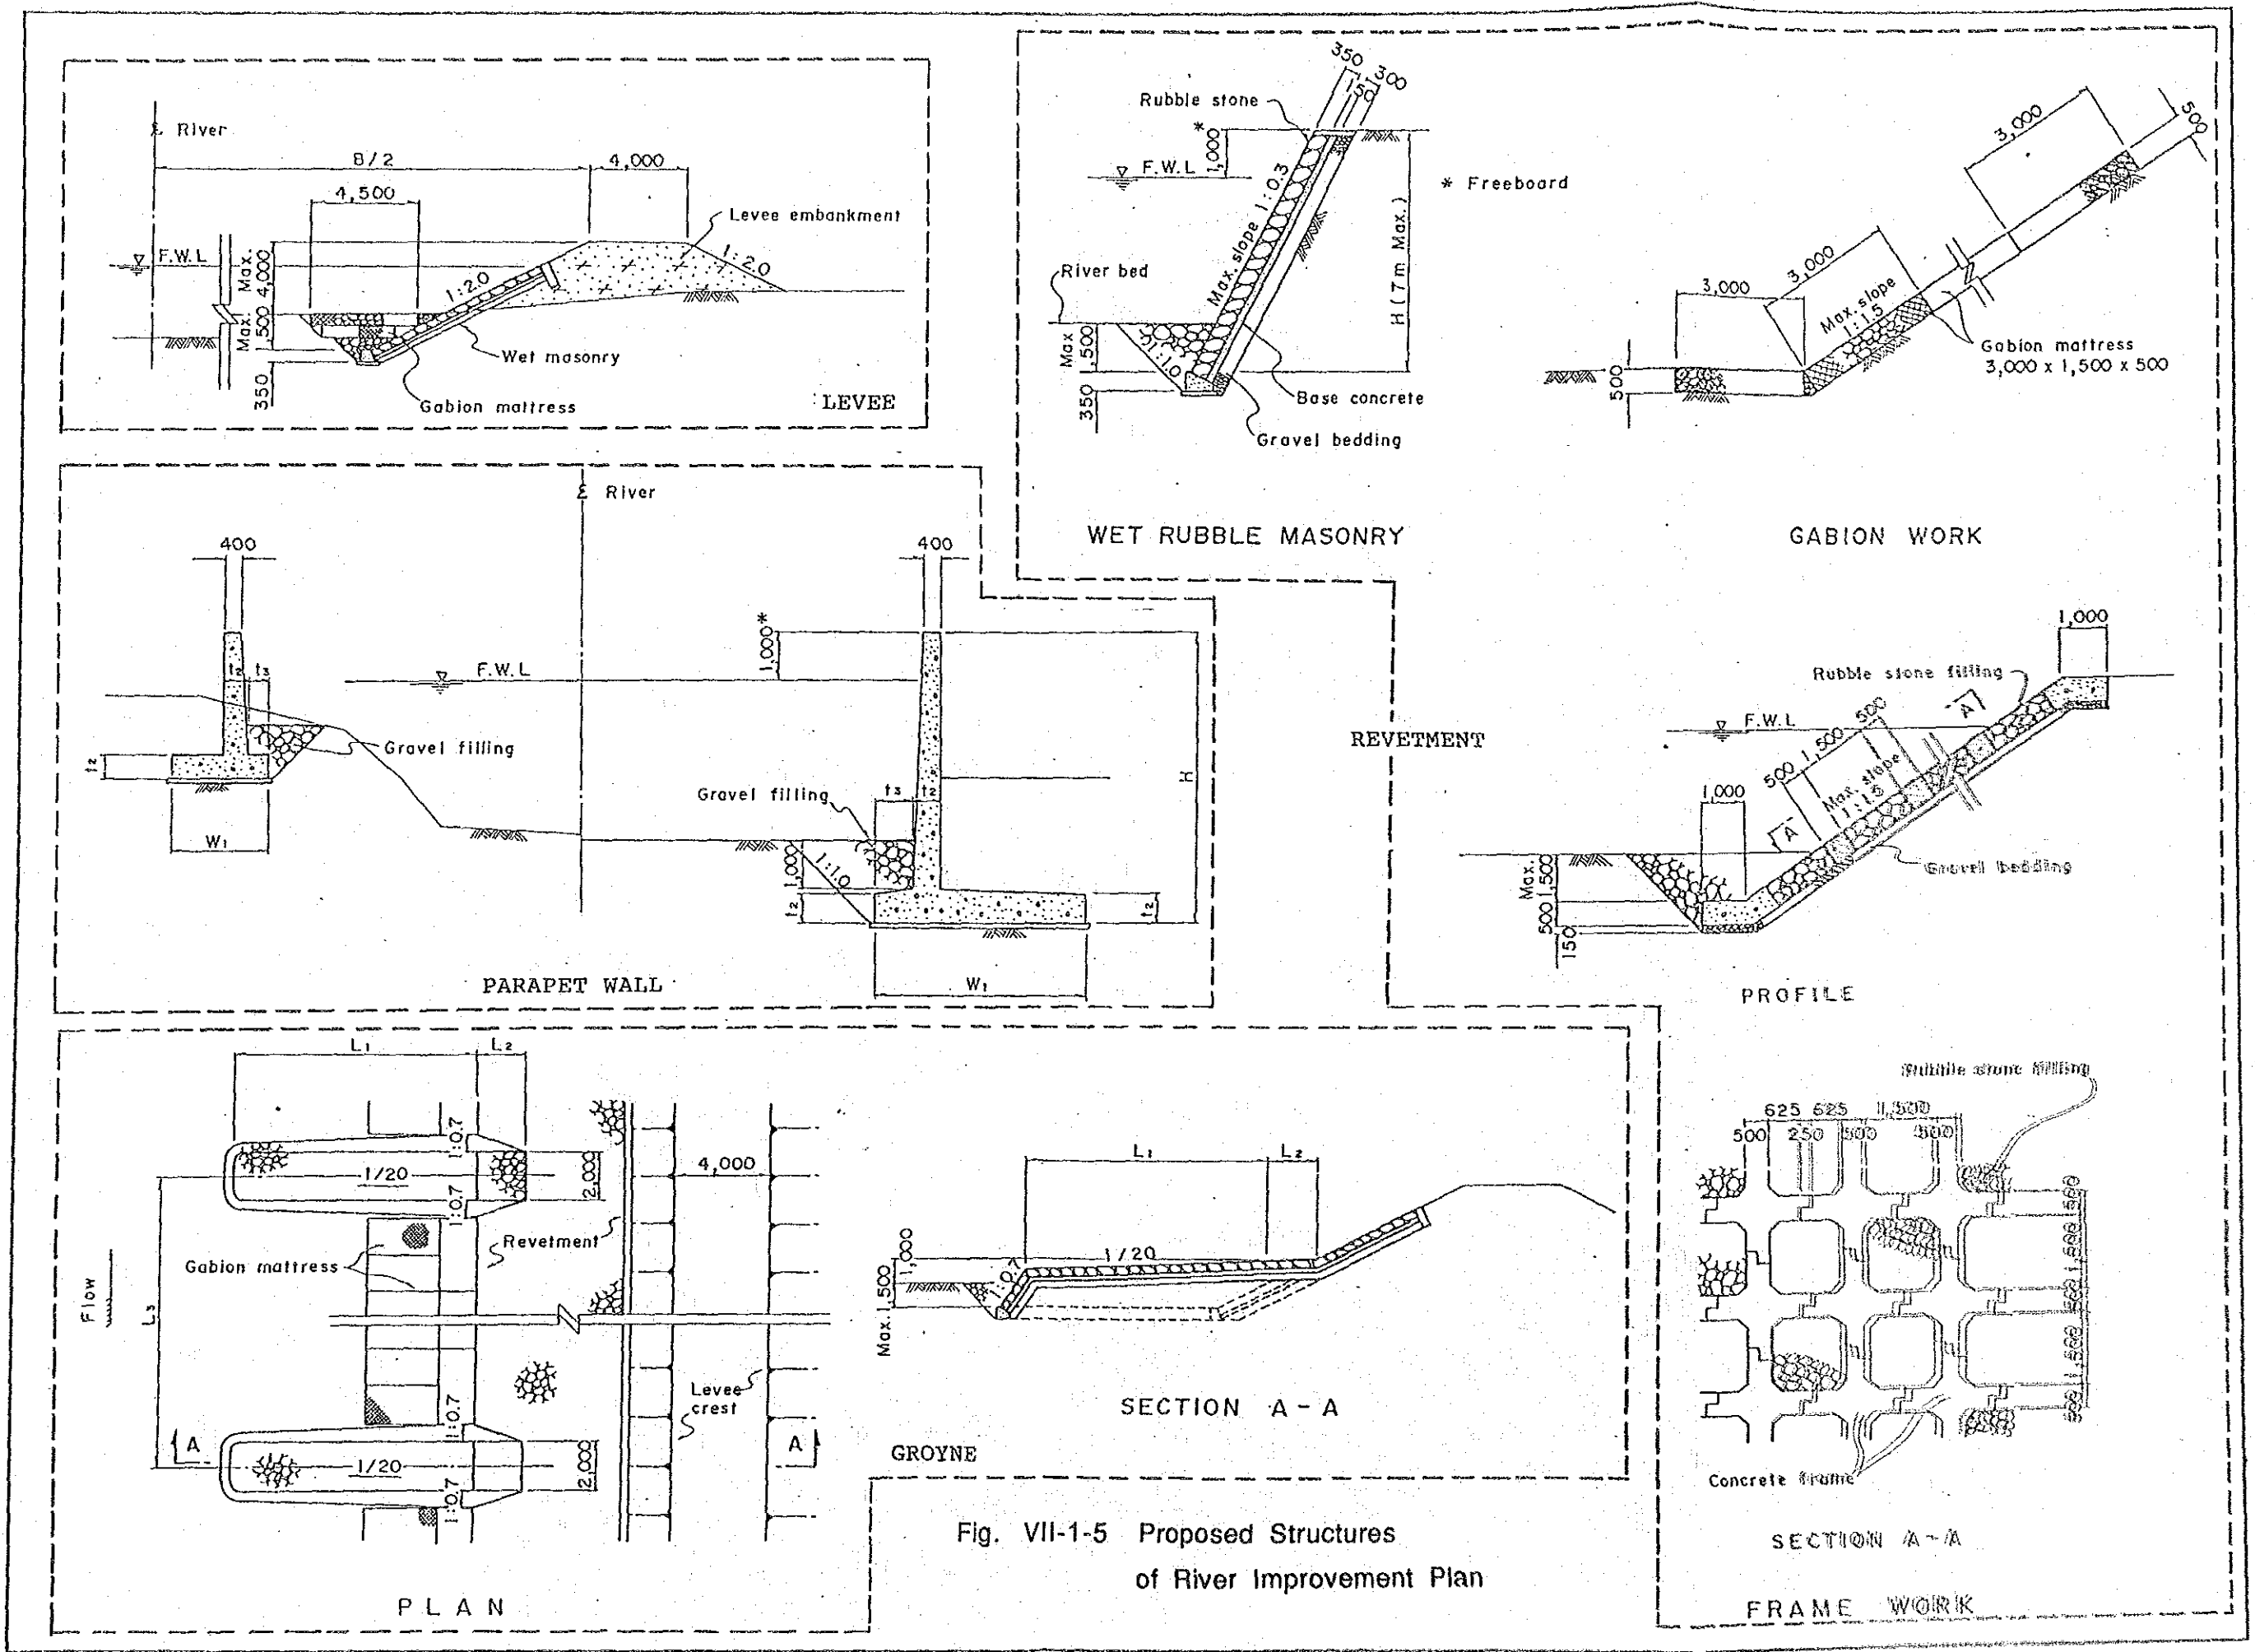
Proposed Structures of River Improvement Plan
